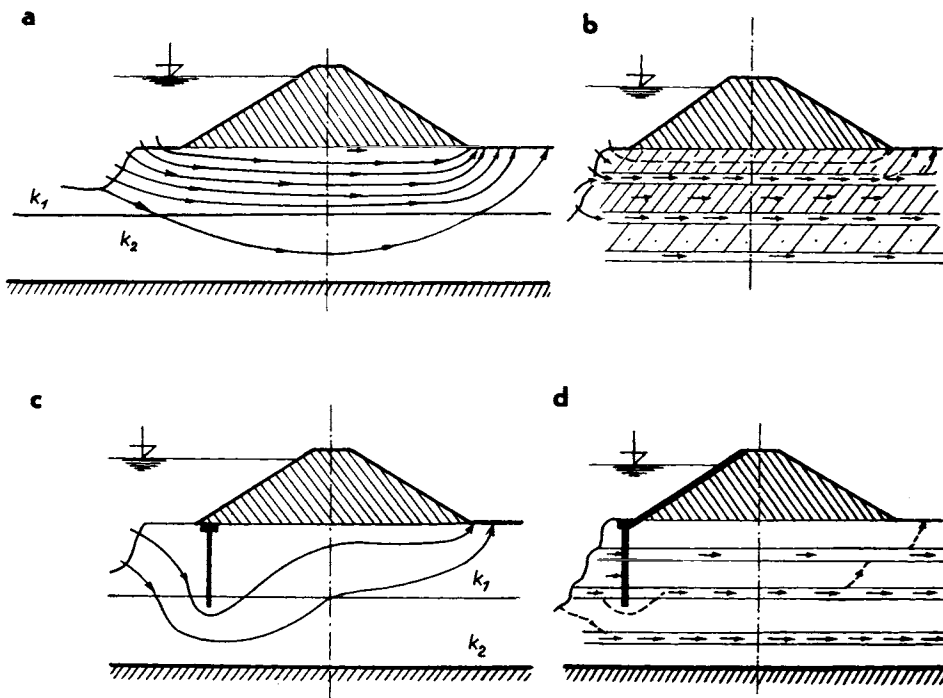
Leakage through a layered subsoil before and after a short wall erection. a, b — without antiseepage measures, c, d — with a wall on the upstream side.
